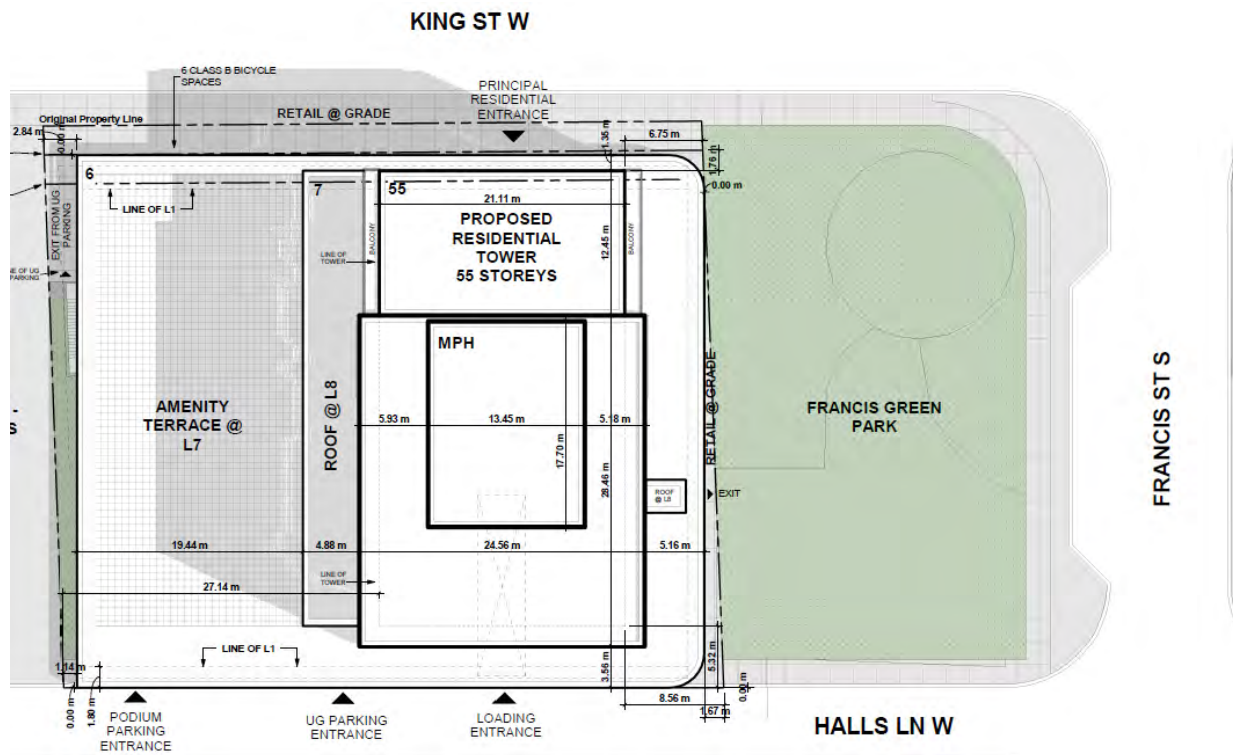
Proposed Site plan. Full site plan and renderings are included as Appendix B (Kirkor Architects)
